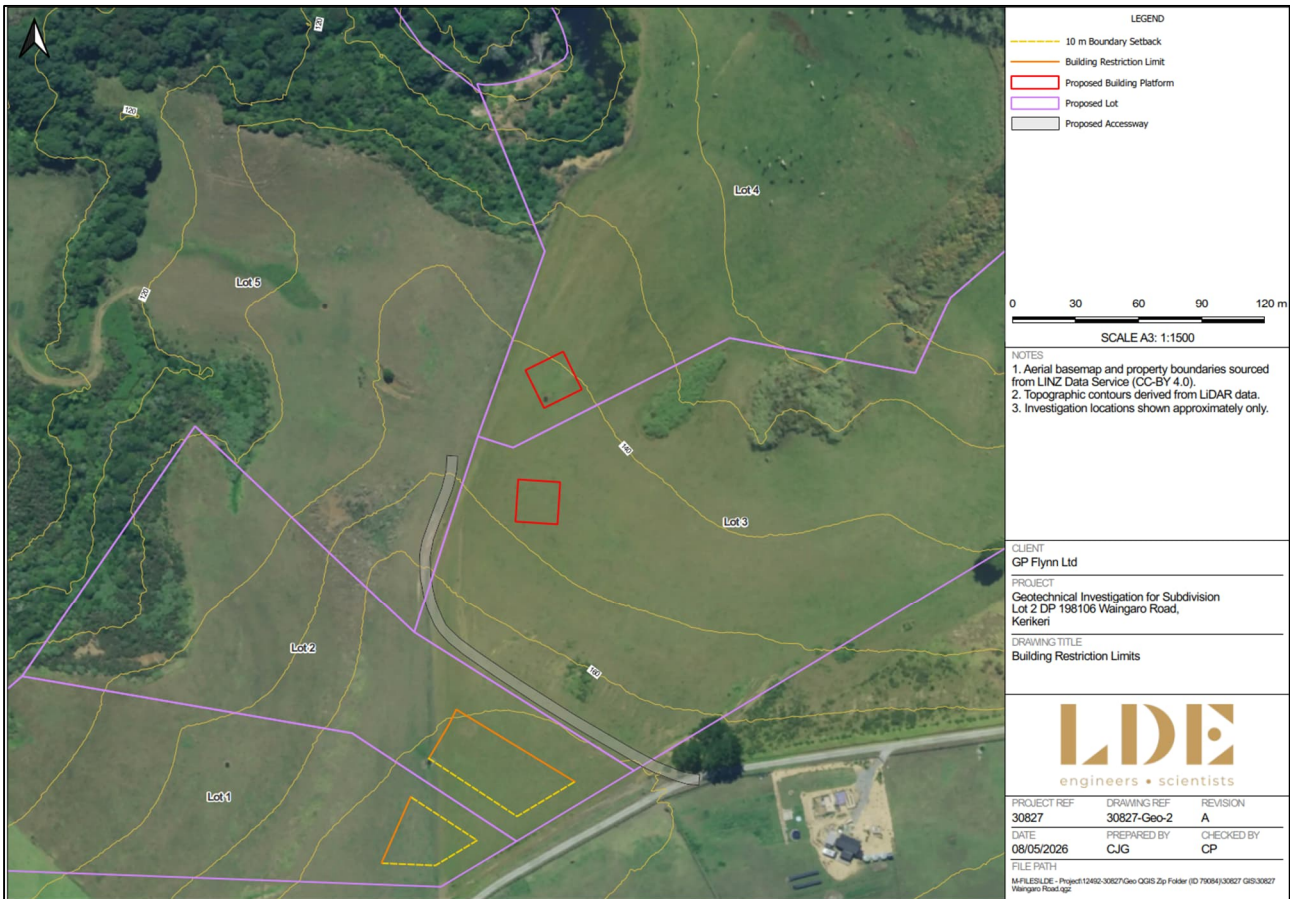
Proposed building restriction lines for Lots 1 and 2. The building platforms for lots 3 and 4 are shown.
